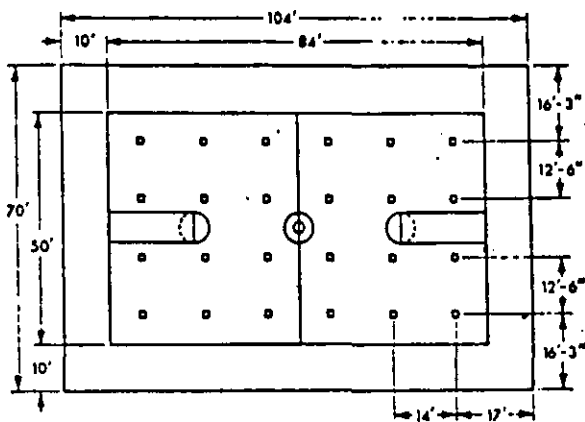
Lighting layout for an indoor basketball court. A distance of 10 feet (3.0 meters) between court boundary and wall is recommended. Minimum luminaire mounting height should be 22 feet (6.7 meters).
